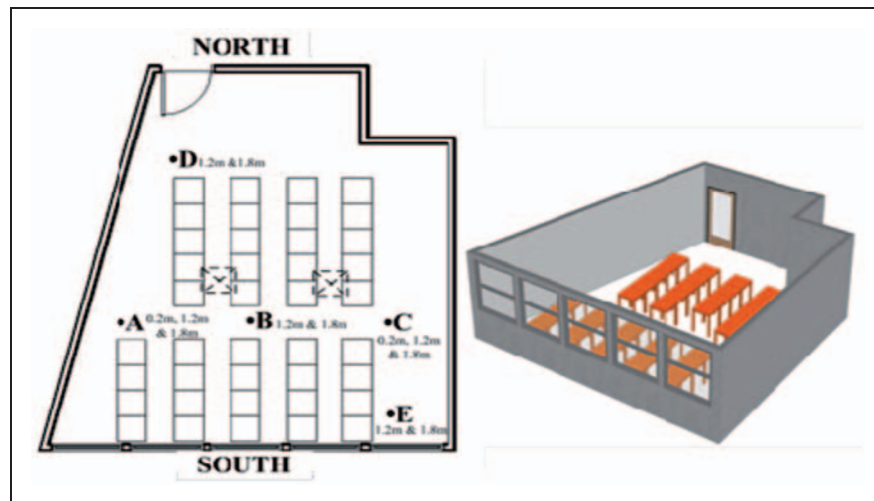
The floor plan and perspective layout of the classrooms 111 in the Palmer Building; the dotted squares are the extractor and supply fans on the ceiling.
